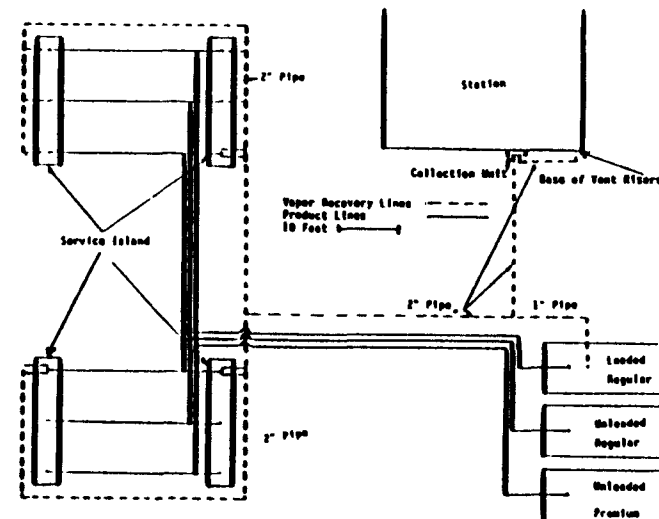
Stage II Underground Piping Layouts for Model Plant 5
